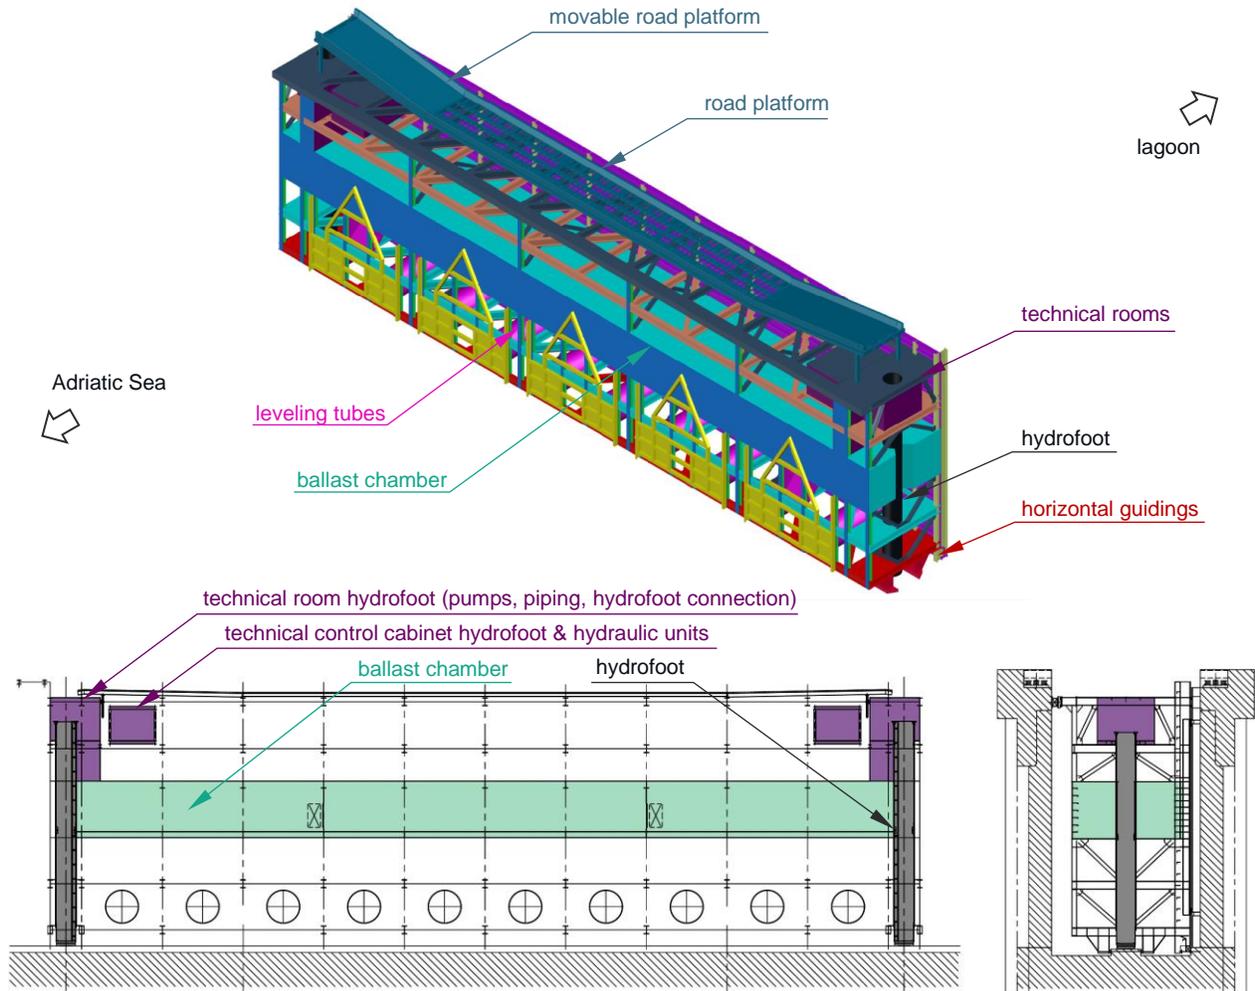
Schematical 3D model & cross sections of the existing lock gates.
